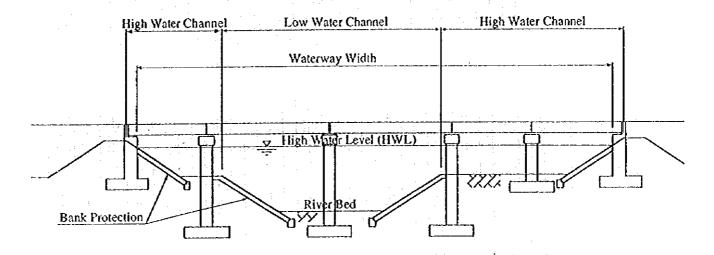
General River (Compound) Cross-section and Bridge Layout
